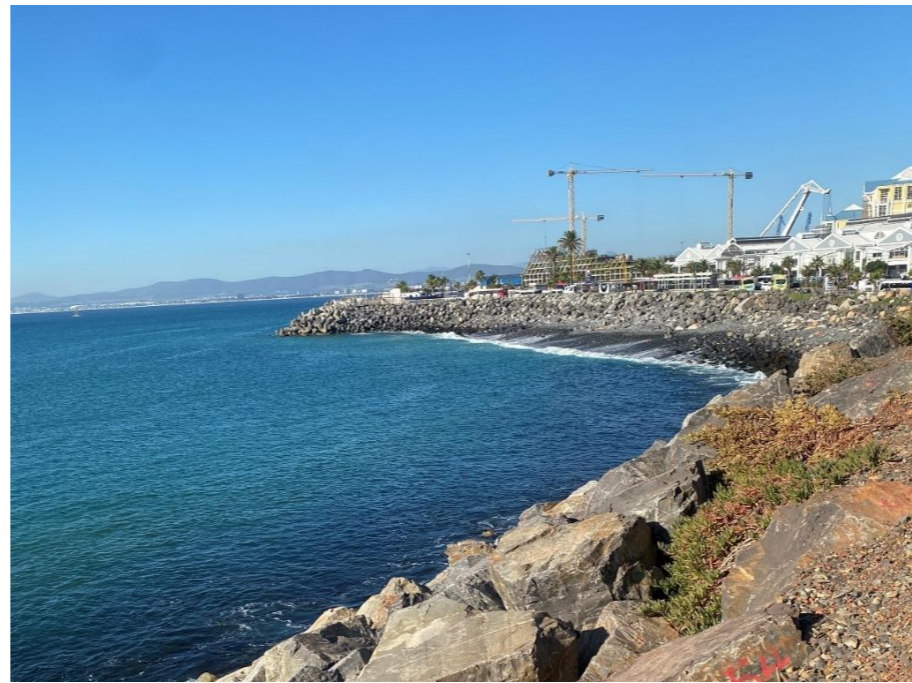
View of the construction spoil area on site (location of the previous The Lookout Venue)
